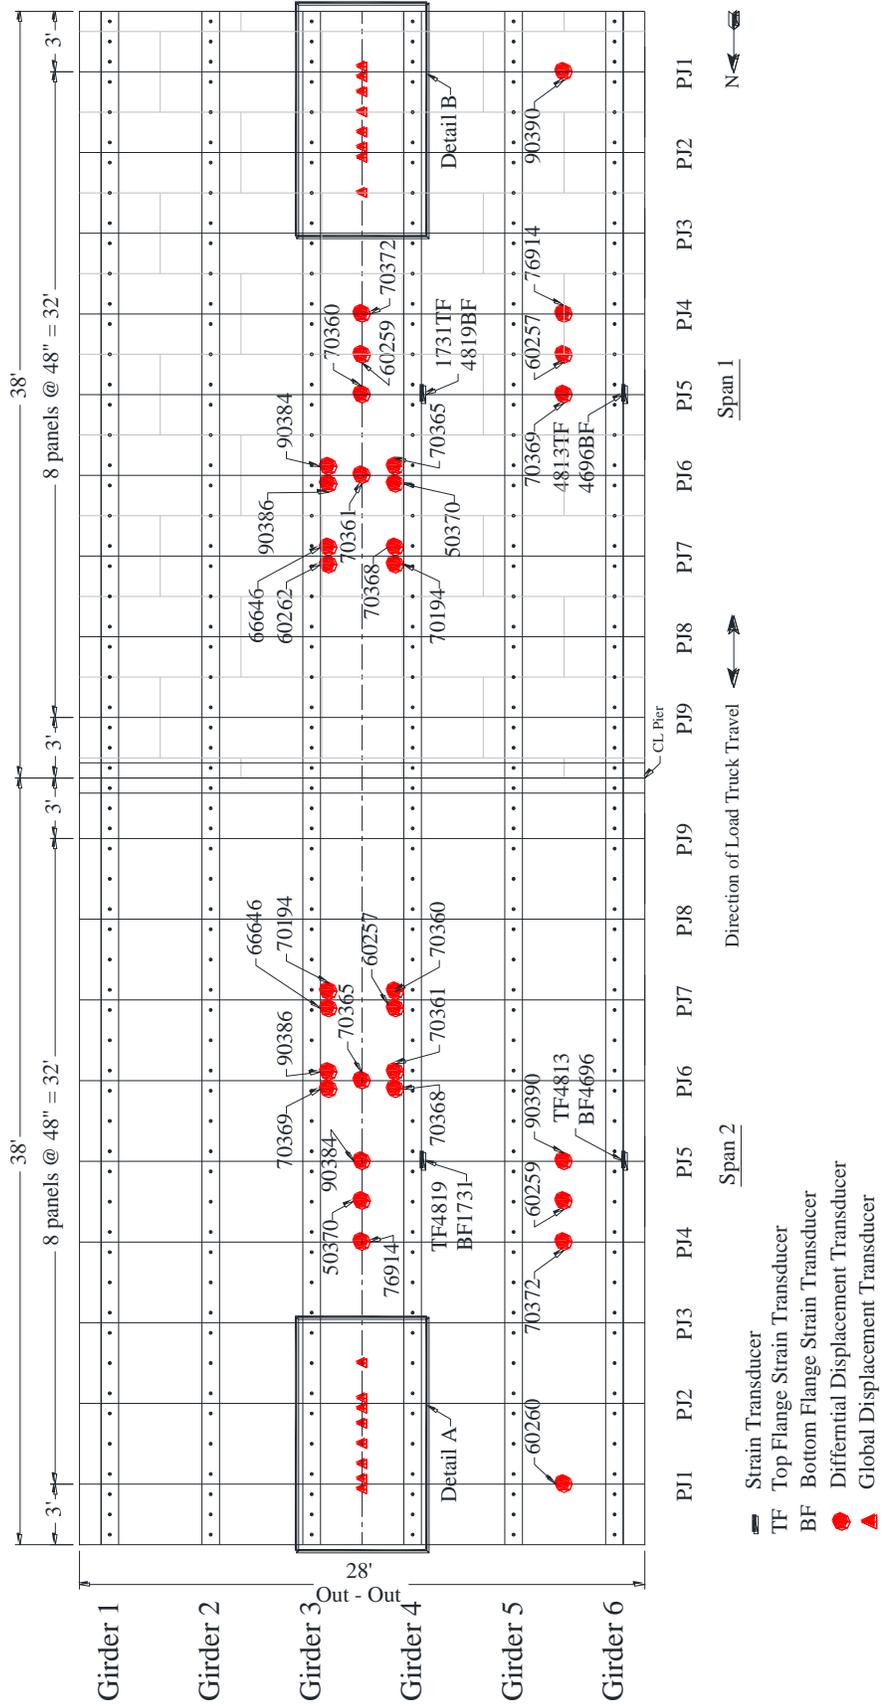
Instrumentation layout, demonstration bridge test 2010
